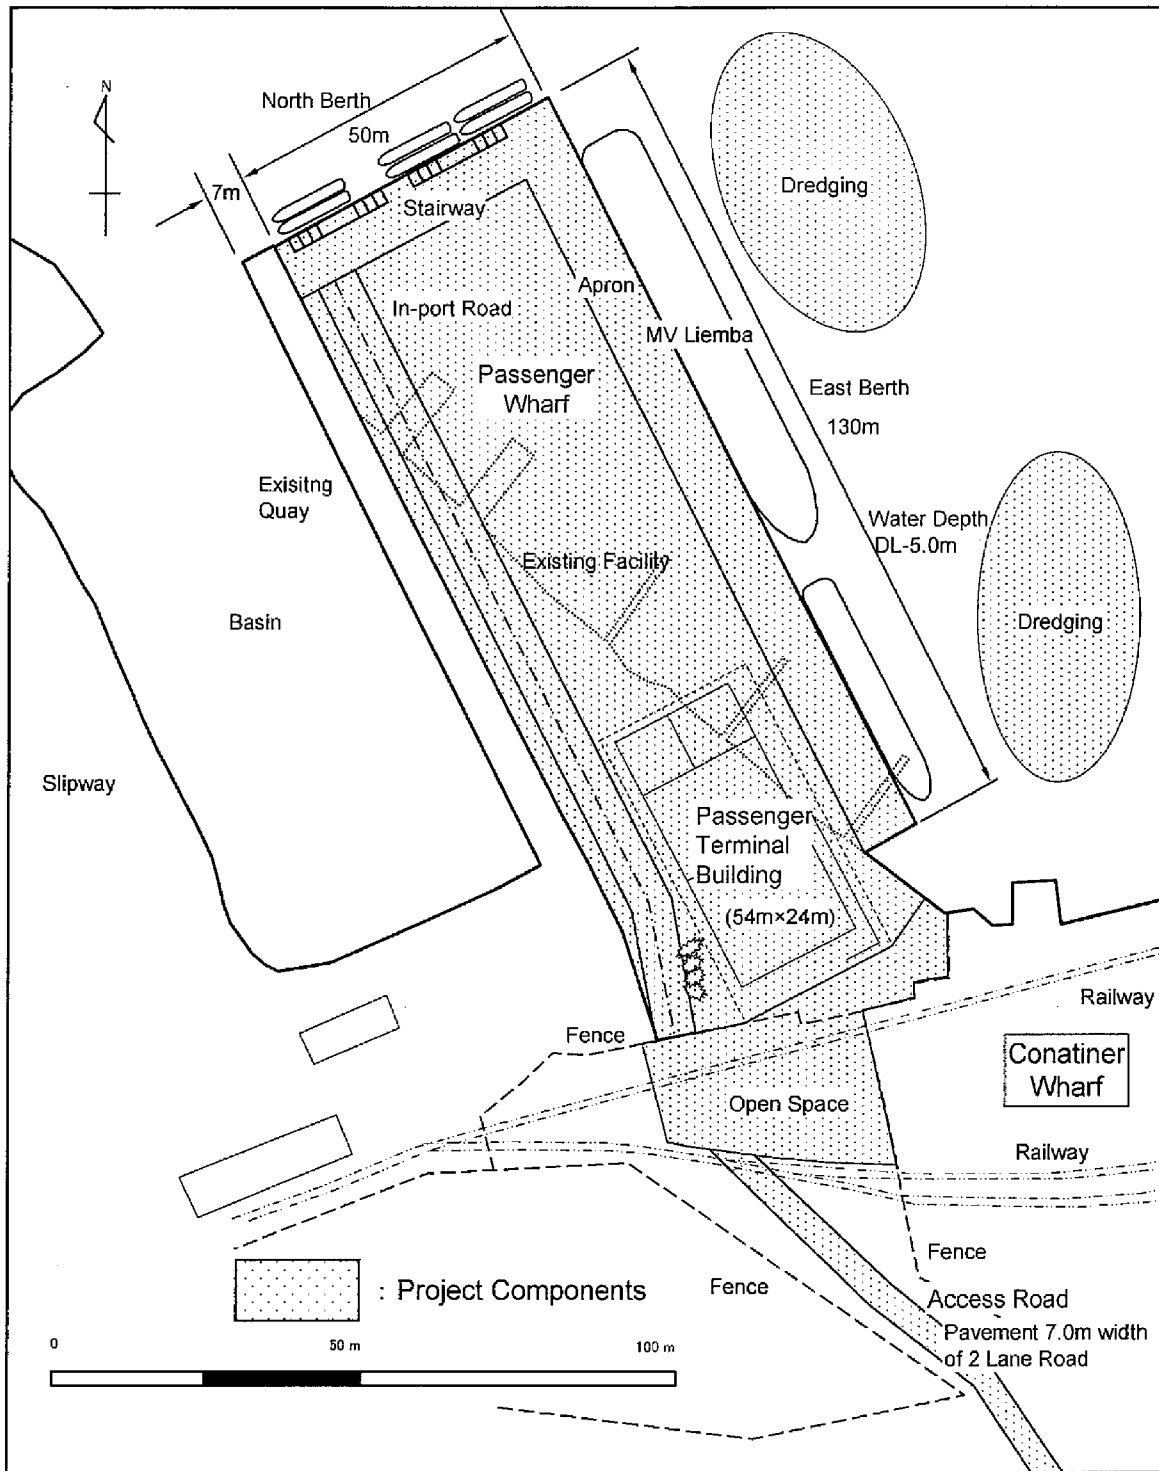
Layout Plan of Passenger Wharf
